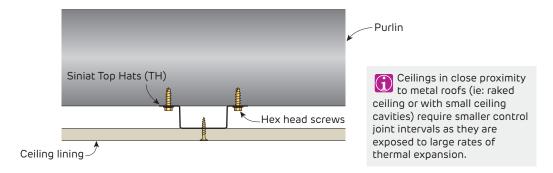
Internal or External Top Hat Ceiling under Purlins
